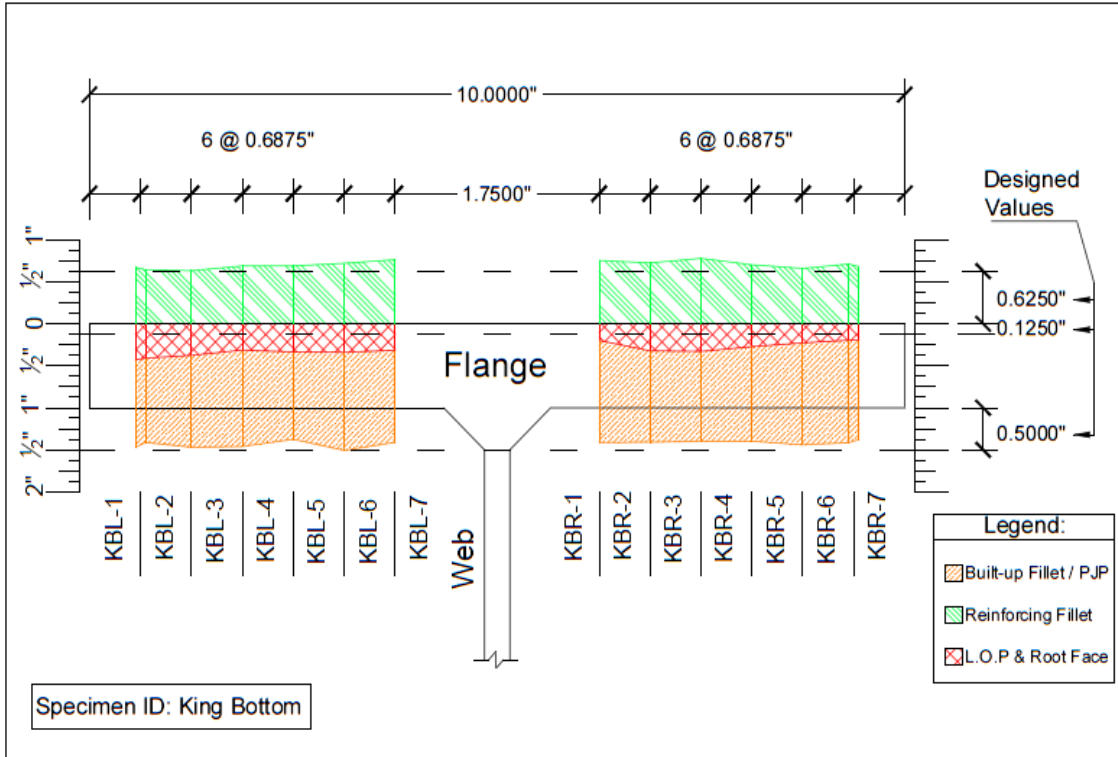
KB- Cross Sectional Weld Penetration View
